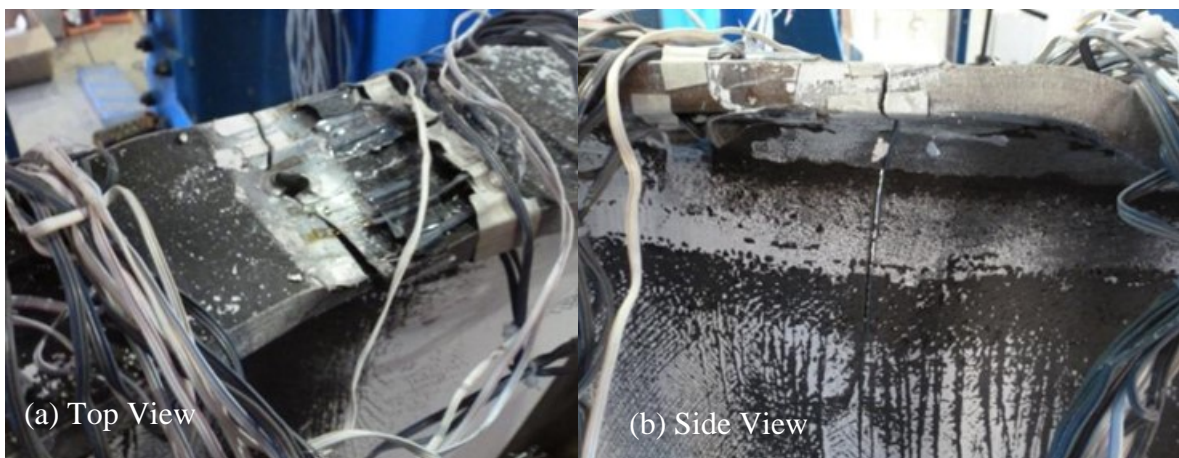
Fracture of the Flange and Web in Specimen 2 (W24x62 with RBS and PAF at 12 in.)
